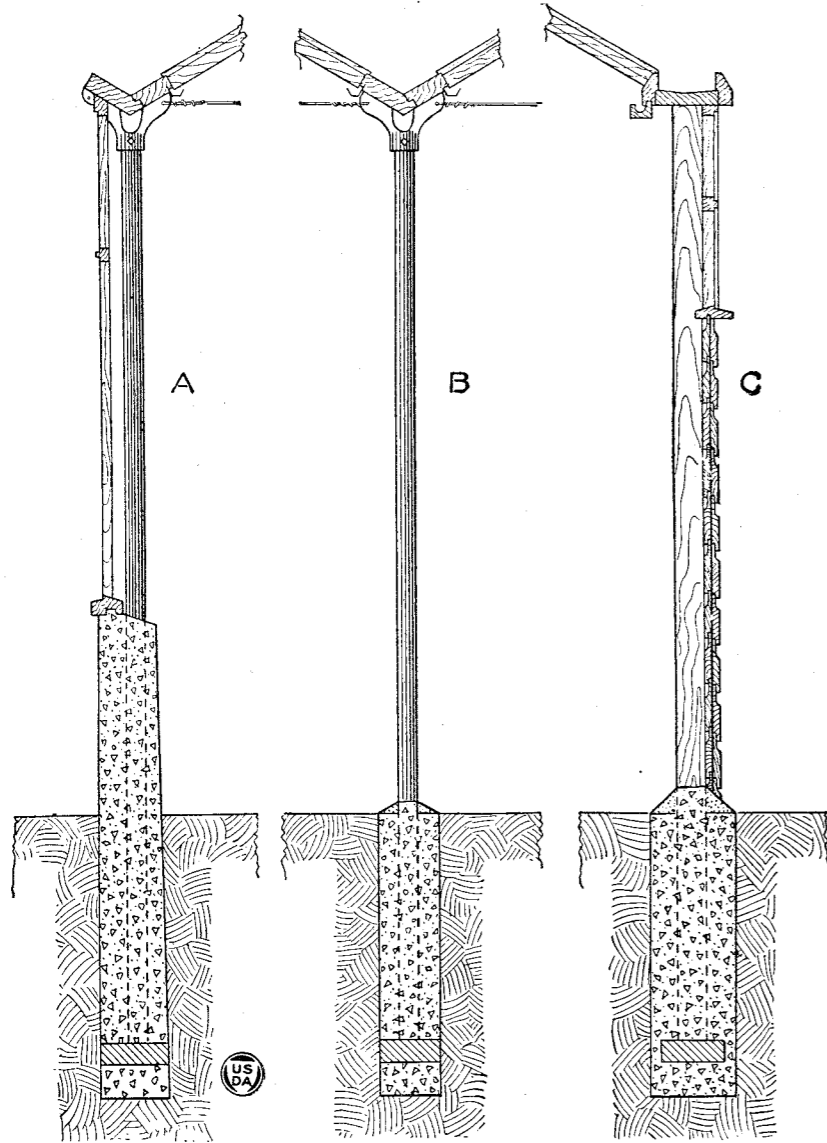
Detailed plans of walls, posts, and gutters for a ridge-and-furrow house: A, Outside wall with iron post embedded in concrete; post top fitting and wooden gutter construction; B, inside gutter with iron-pipe post; C, outside wall, wooden post, gutter, and sheathing.
